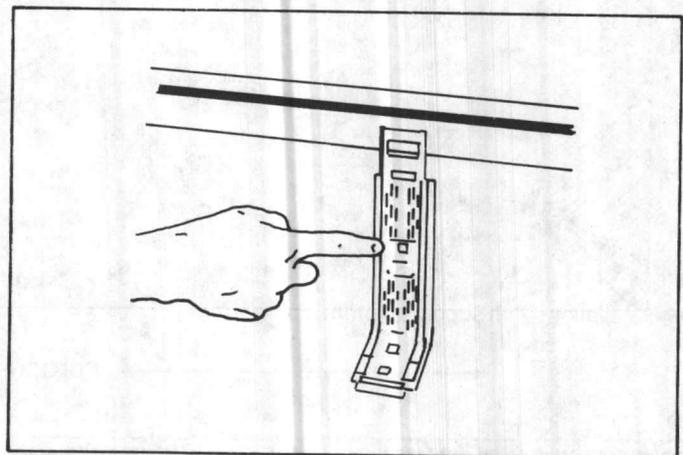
Hole for Fastening Enclosure Bracket to Wall
